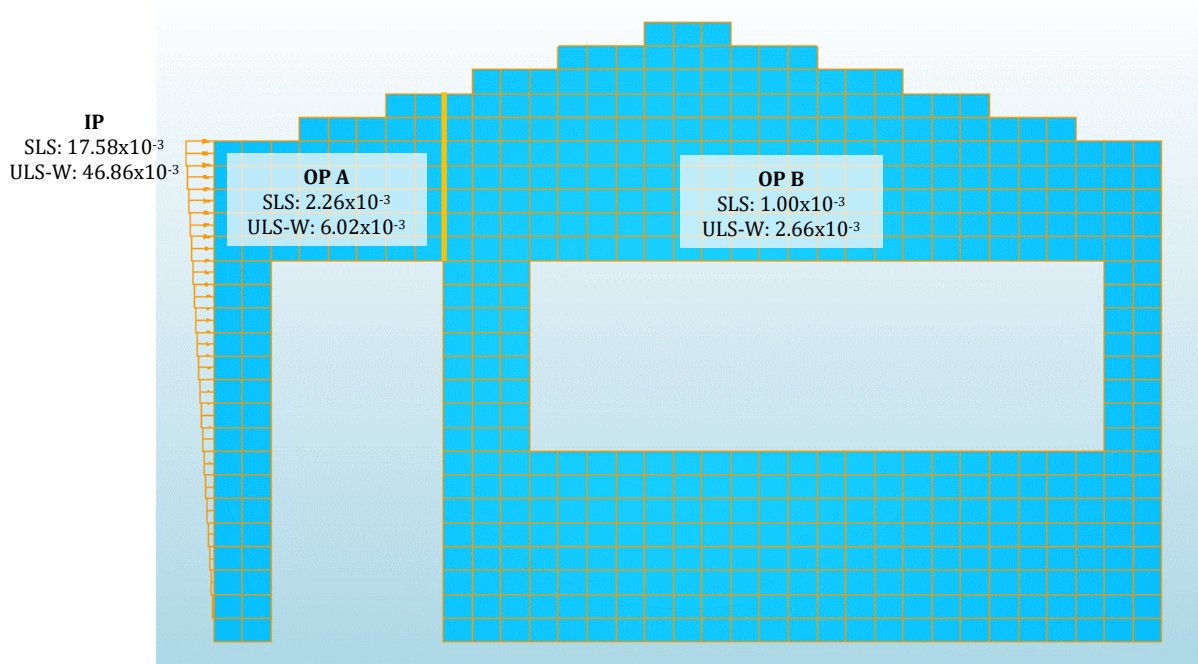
Critical design load pressures [N/mm<sup>2</sup>] for wall W2 SLS and ULS-W
